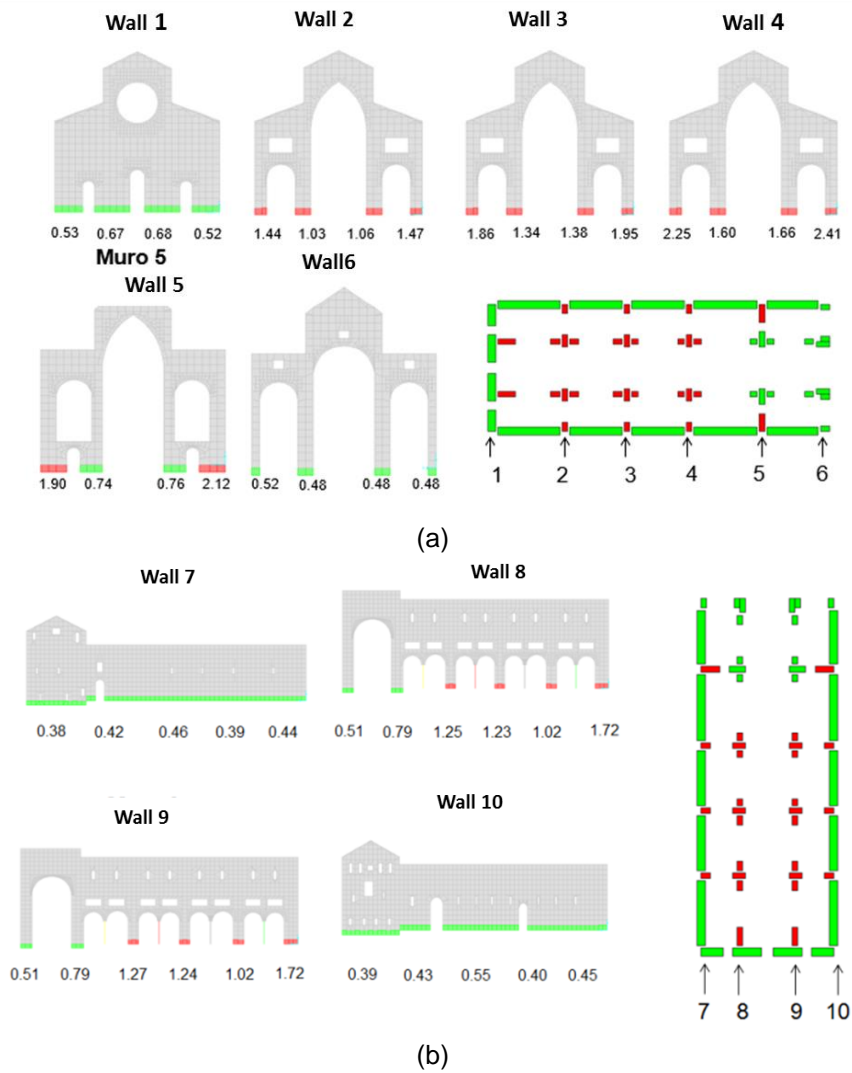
Sliding check for all the walls of the cathedral: (a) transversal walls and (b) longitudinal walls
